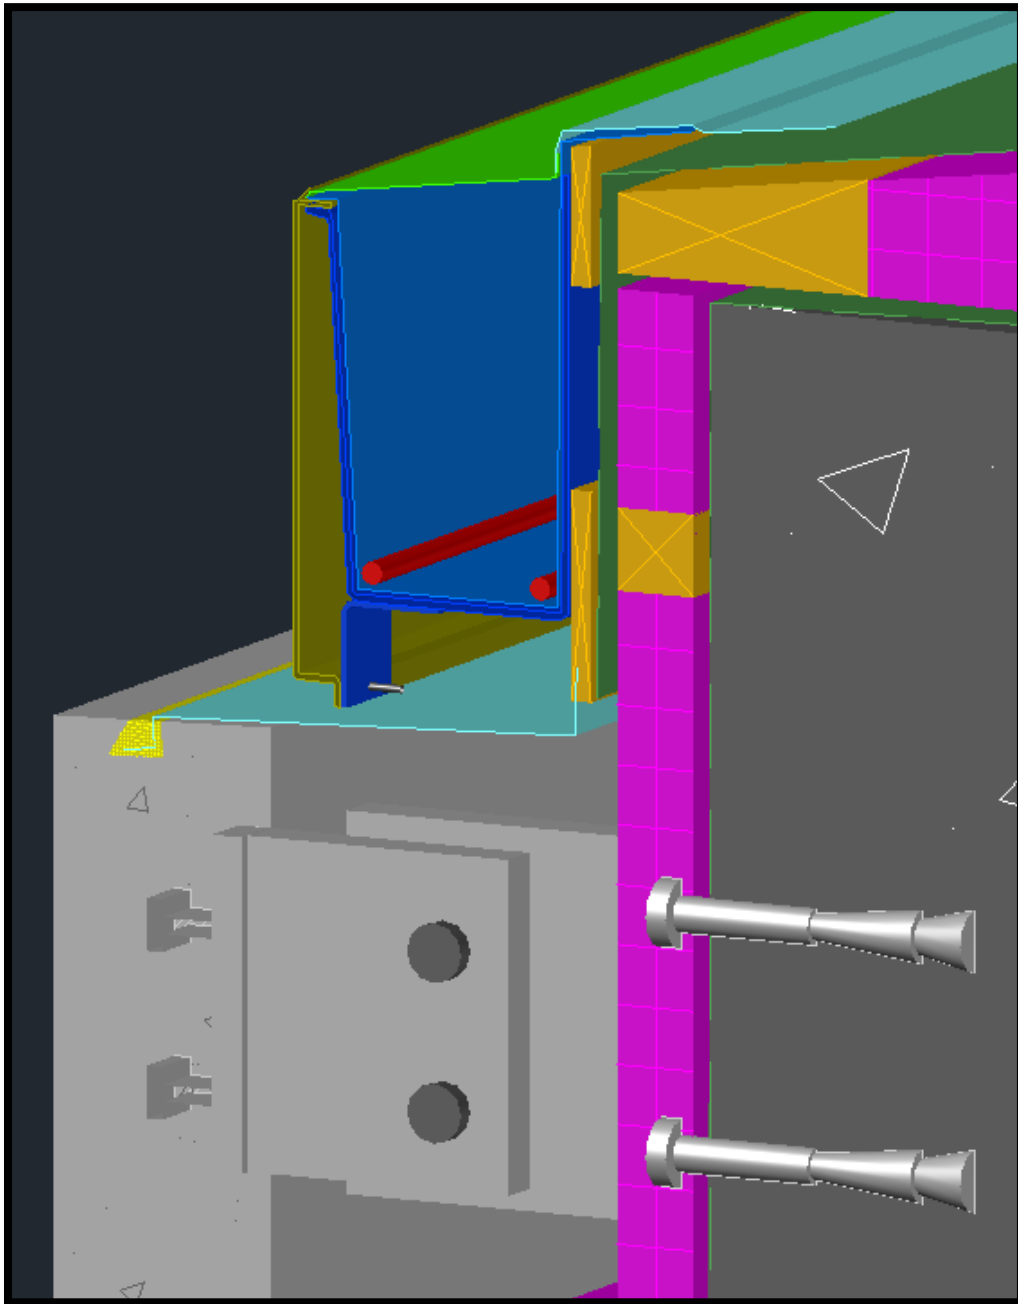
A close up image of the virtual mockup showing how the arch. conc., gutter system, insulation, roofing, and water proofing are connected the concrete wall.
